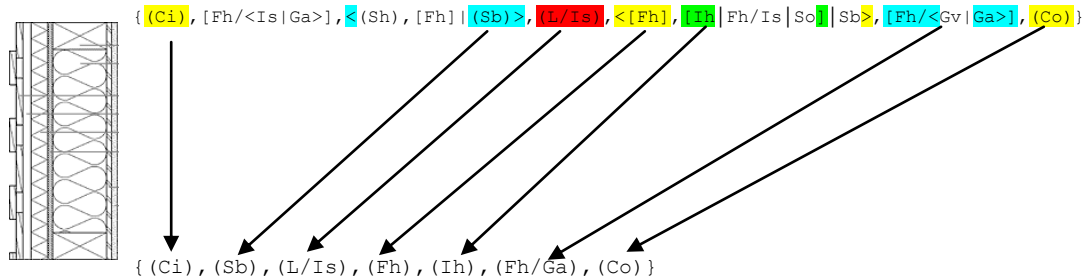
Outside wall construction awroho01a (Source: www.dataholz.com)
